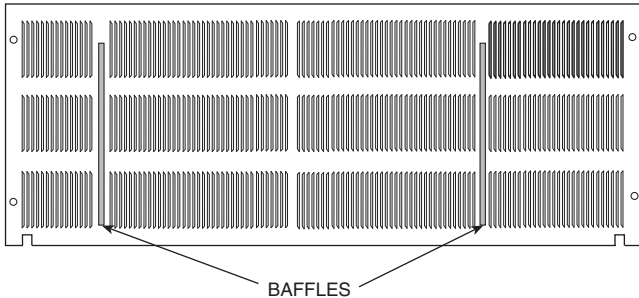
REMOVE EXISTING BAFFLES ON COMPETITIVE OUTDOOR GRILLES
